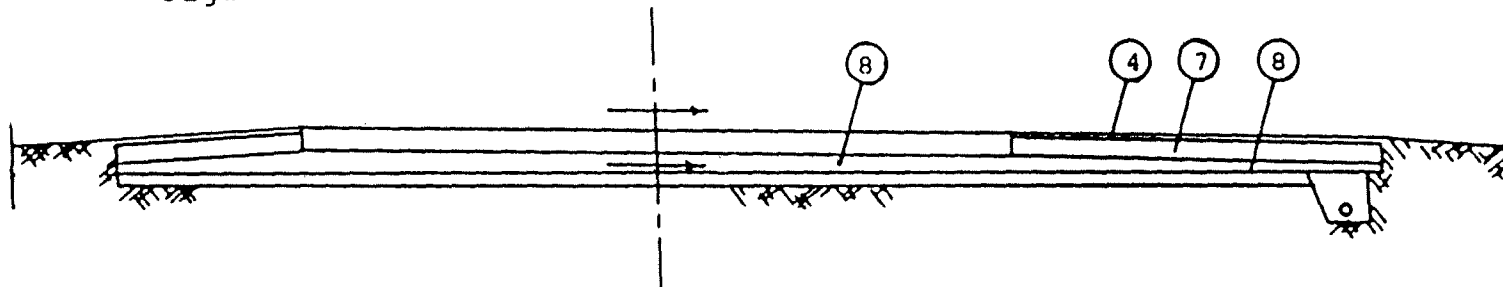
Road cross-section drainable to the edge of pavement collector.[50]
